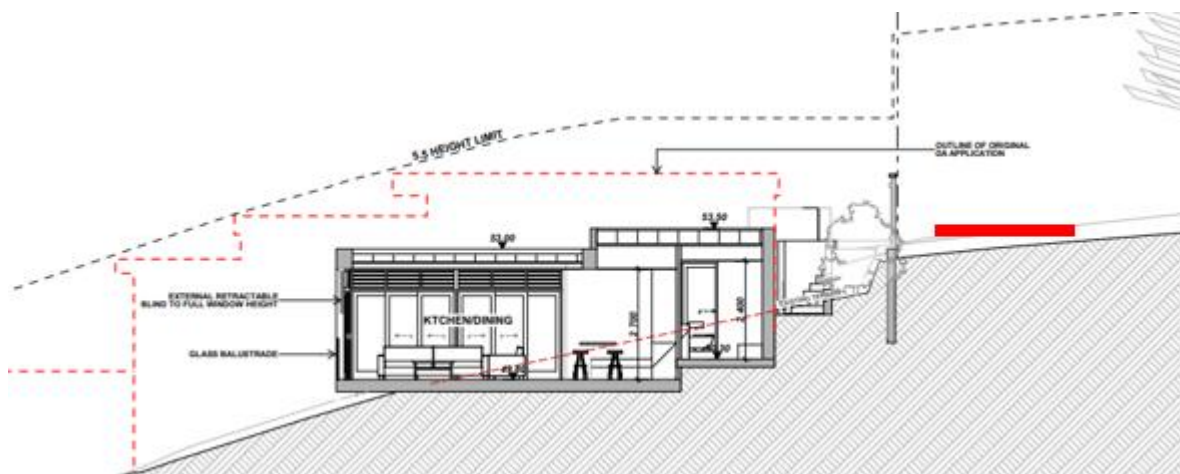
Extract from approved secondary dwelling plan submitted section showing relationship of proposed pool coping level to the rear boundary and our clients secondary dwelling.
